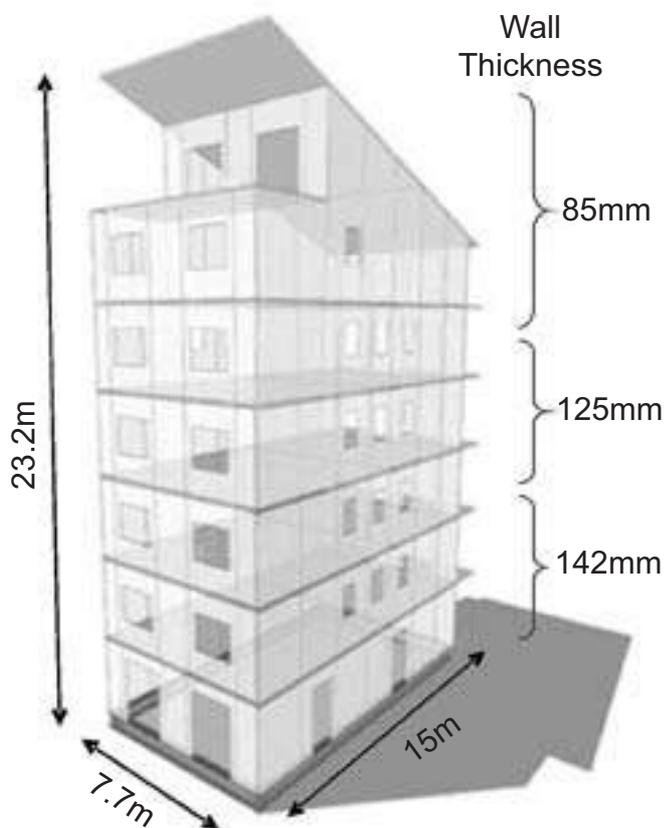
Seven storey cross-laminated test building dimensions and wall thicknesses.
